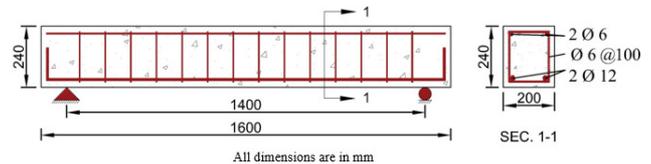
Dimensions of the tested specimens and reinforcement details.
